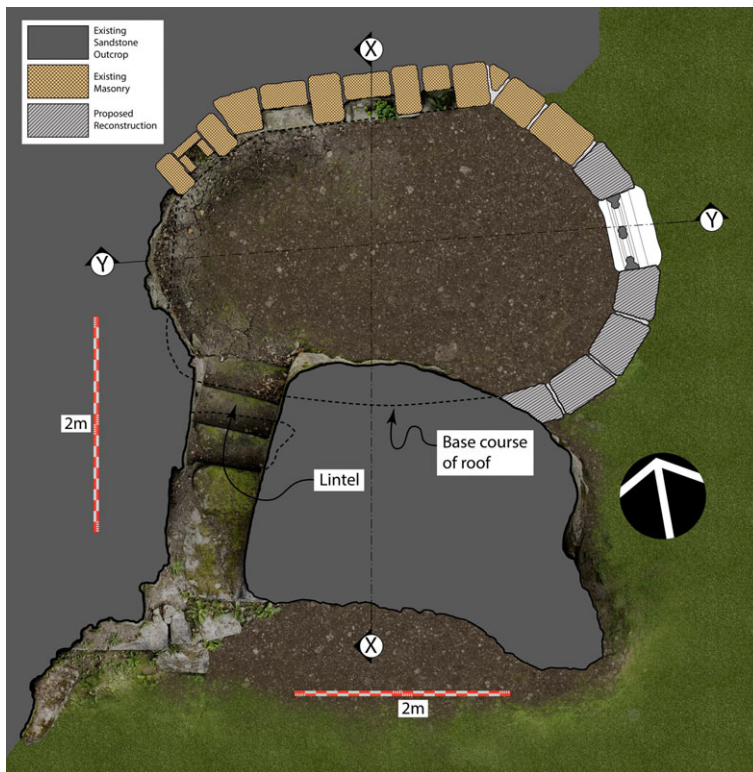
Reconstruction, c 1750–1837: plan at ground level. *Image:* authors.
